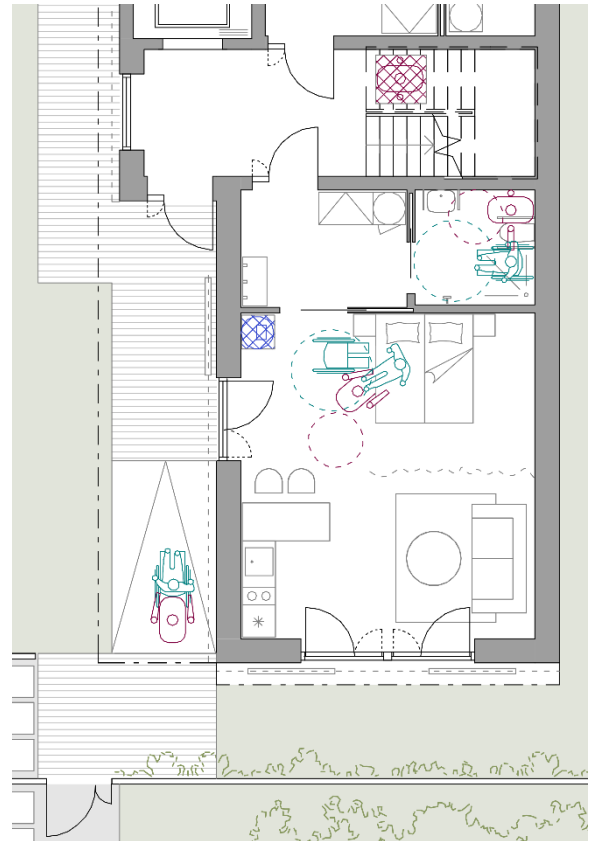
Detail of the revised design of the building – Type B – Family type house. The entrance area and smaller flat. (Source: Rollová, Bošková Filová, 2023)
